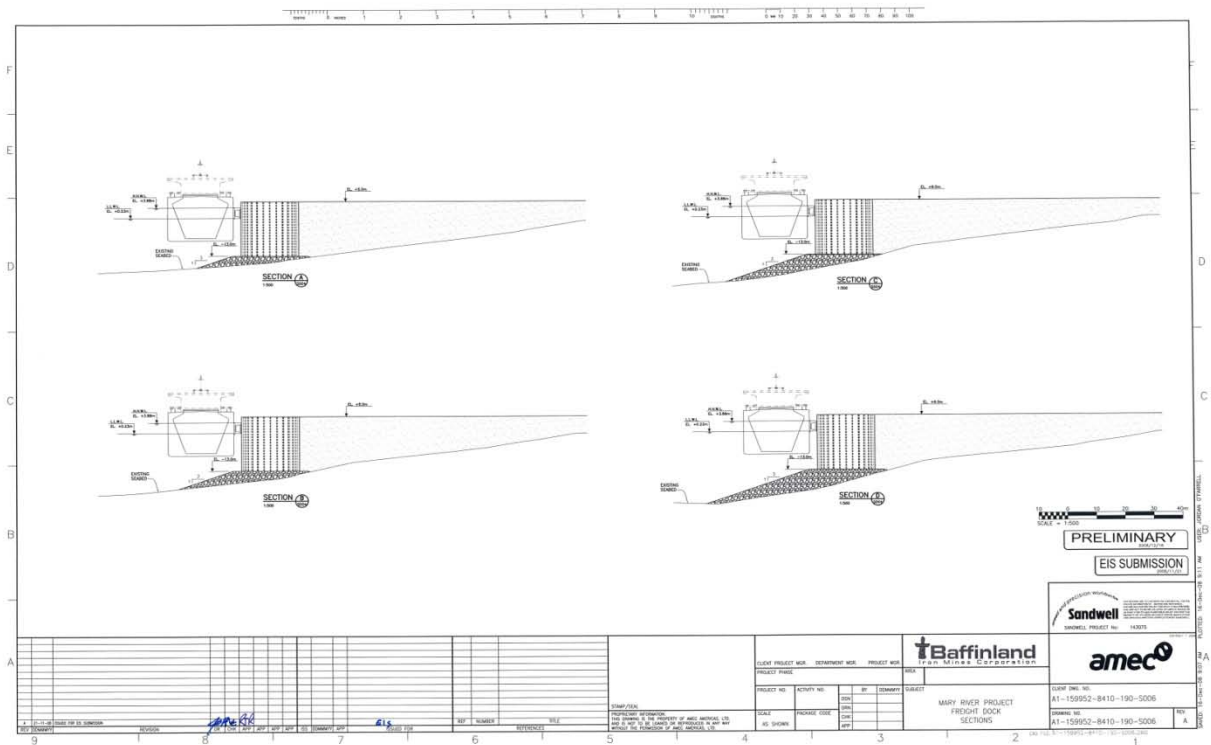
AMEC Drawing Number A1-159952-8410-190-S006
